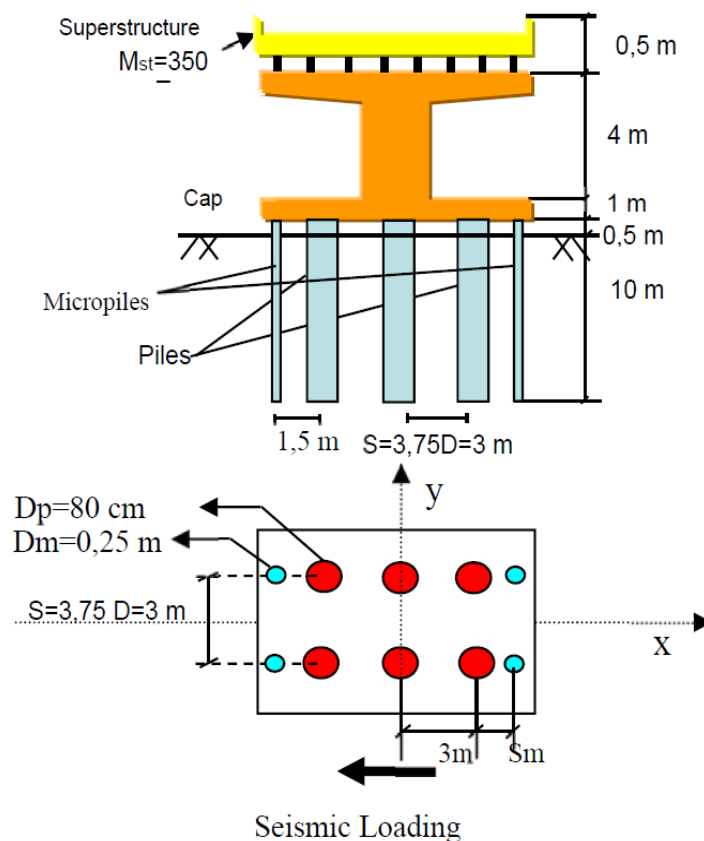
Bridge foundation reinforcement using micropiles (Alfach 2019)
